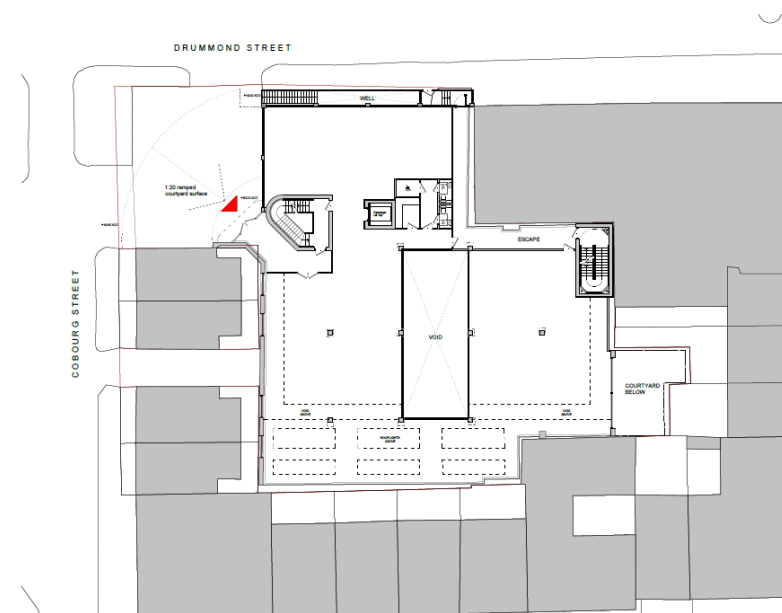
Proposed Ground Floor Plan (Source: CZWG, September 2016).
